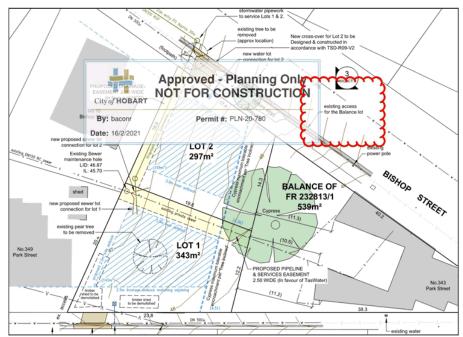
The approved plan of subdivision, showing the approved access to 343 Park Street off Bishop Street.
